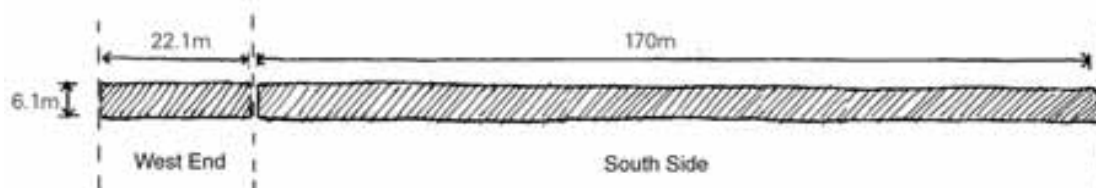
C FUTURE ADVERTISEMENTS PLAN VIEW
